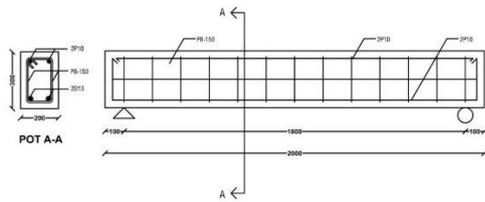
Detail reinforcement of RC beam with lap splice (LS)
